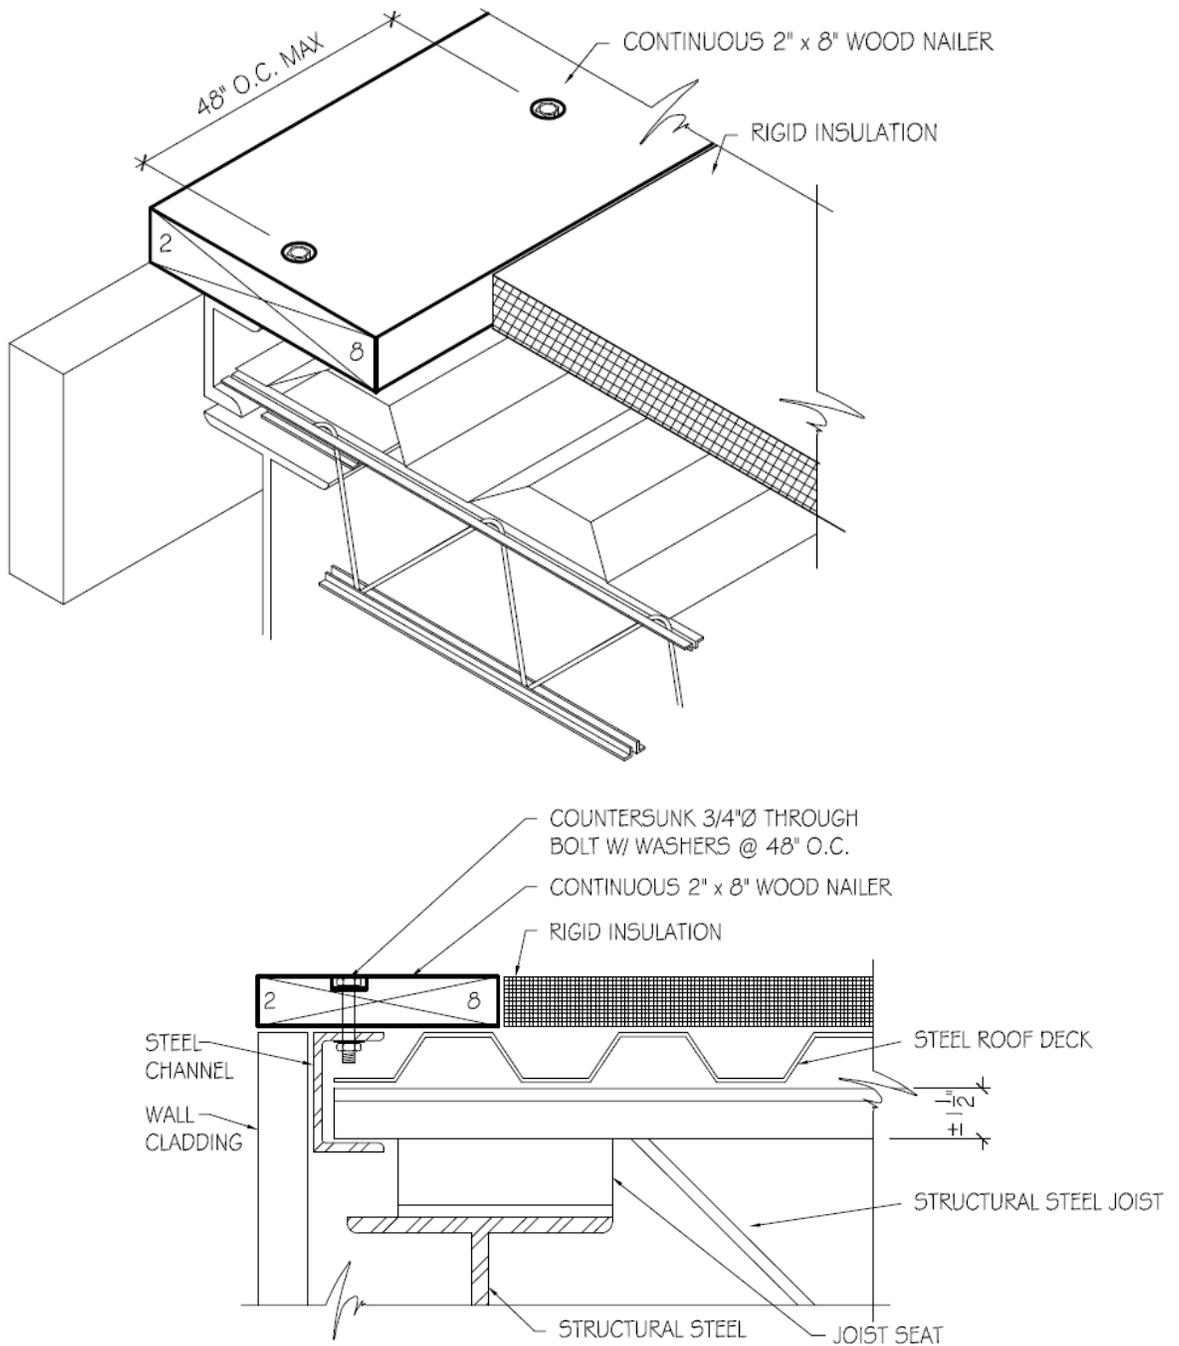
ROOF EDGE WOOD BLOCKING - THROUGH BOLT ANCHORS
